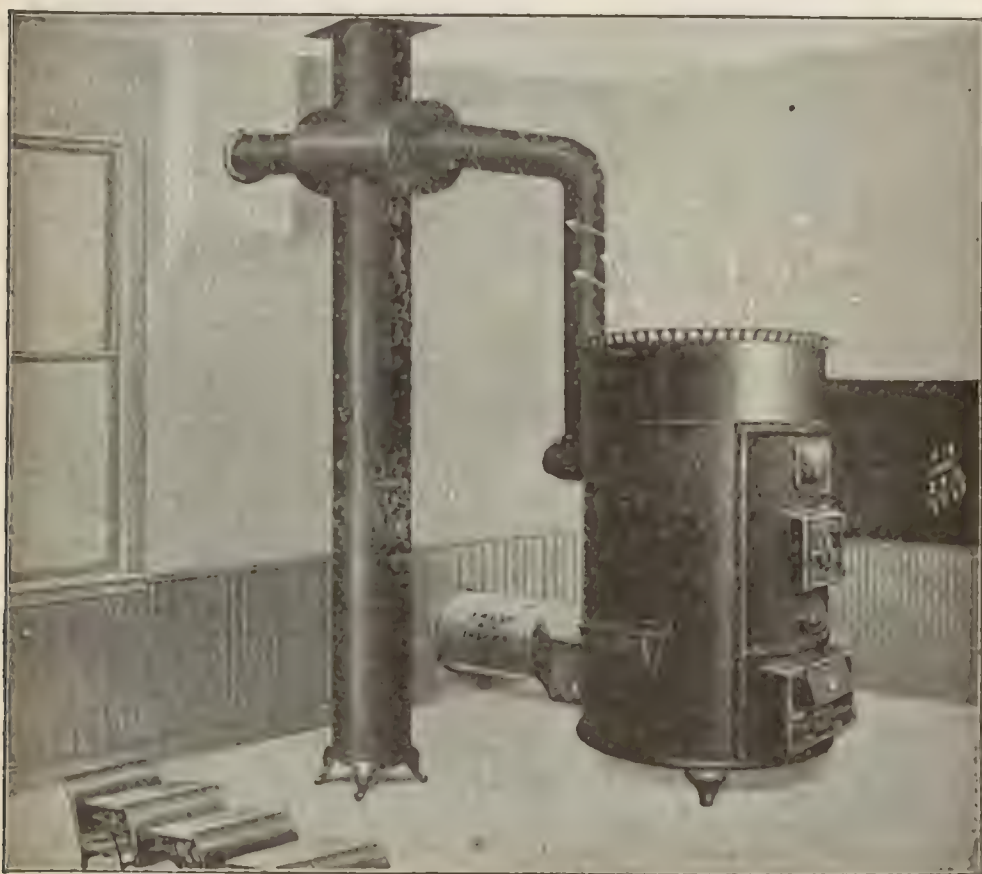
,401.—Favorite warm air heater; school room heating and ventilating system B.
